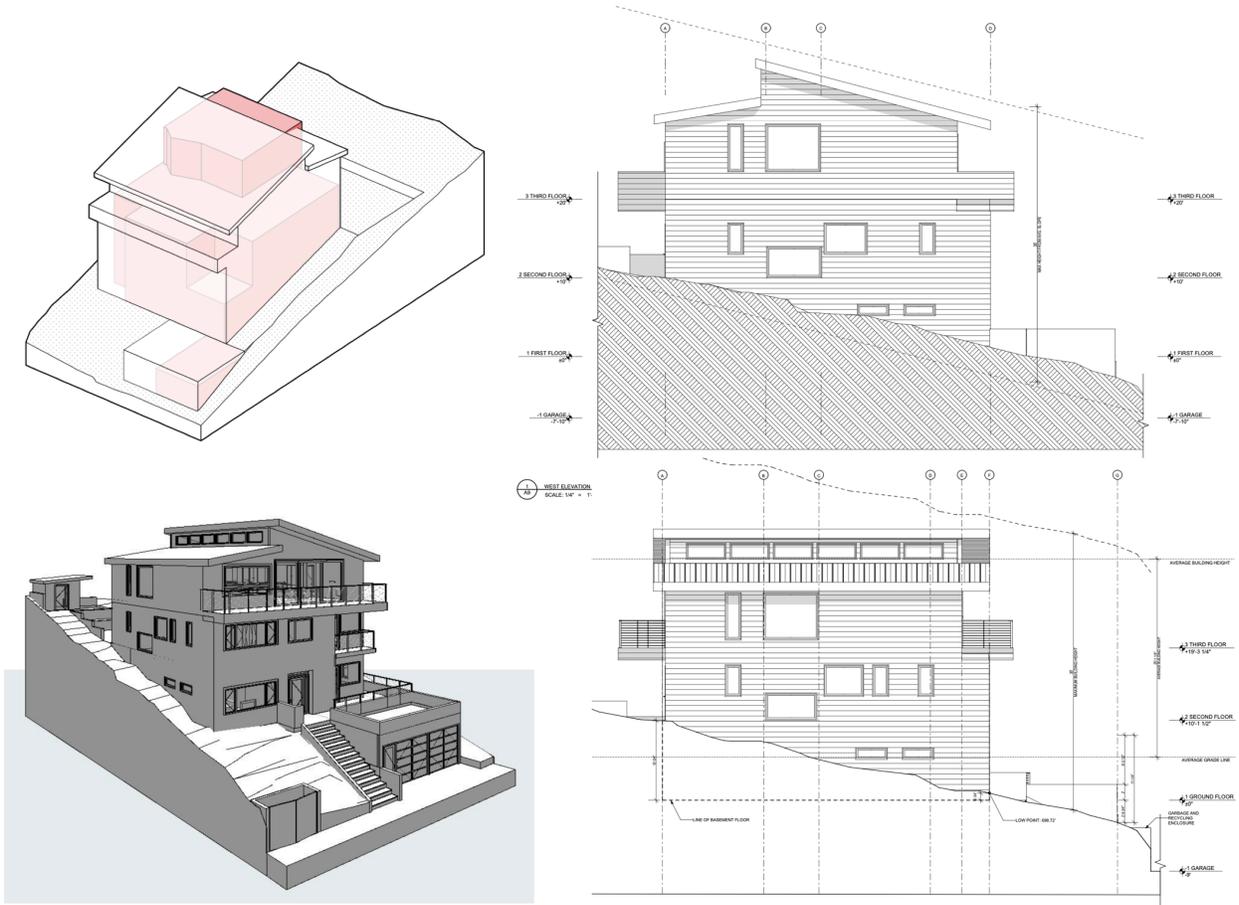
Recent changes in design. We have been sent two versions of the design. Top row: rendering and elevation from previous design sent to us in February 2022, with proposed balcony as opaque siding. Bottom row: rendering and elevation from latest design (uploaded January 3rd, 2023) with proposed balcony as wraparound glass. This change increases loss of privacy concerns.
